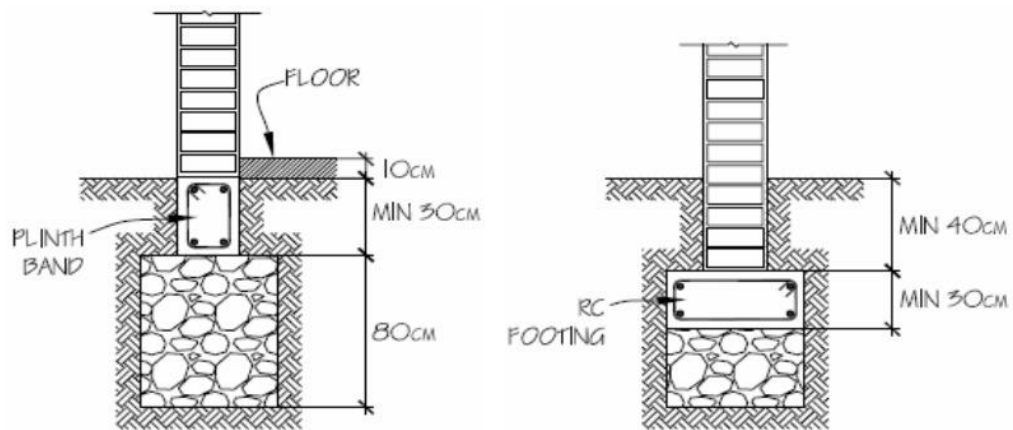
Stone masonry foundation with RC plinth band (left) and RC strip footing (right).
